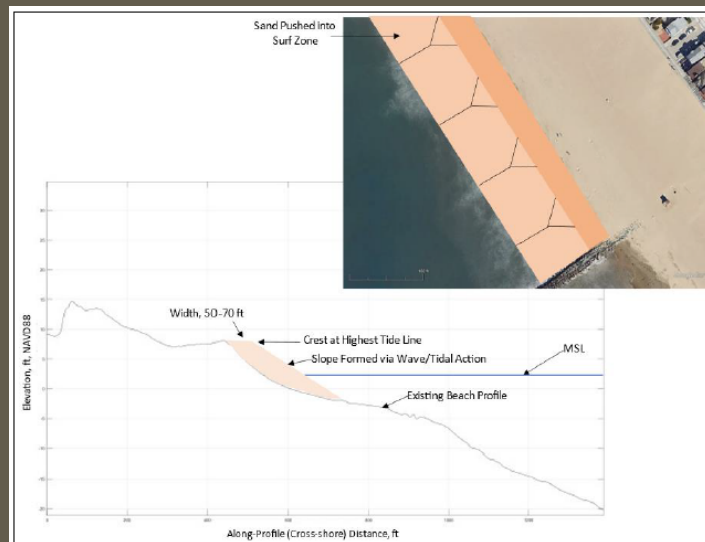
Below Mean High Tide Line Design Plan View and Cross Section
